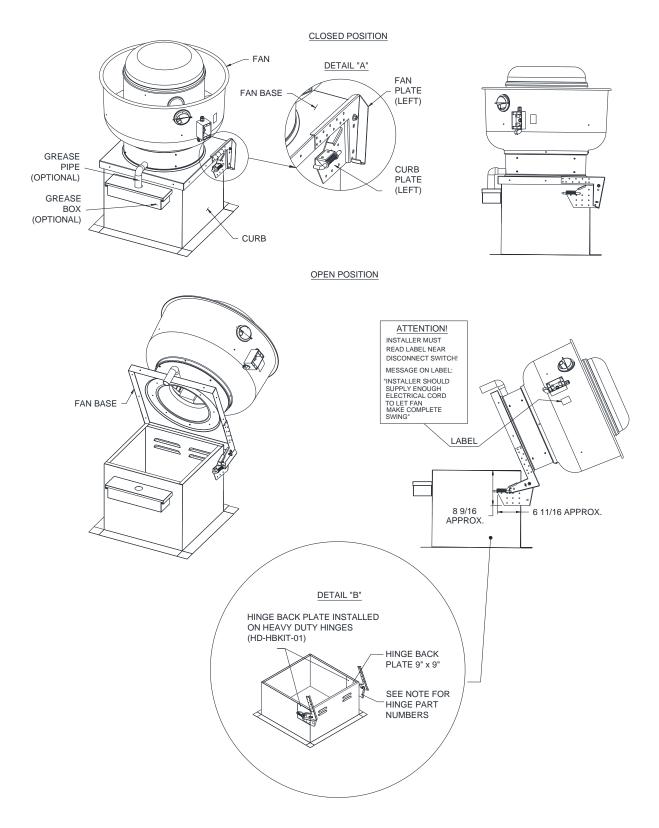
Heavy Duty (HD) Locking Hinge Kit Installation Details
